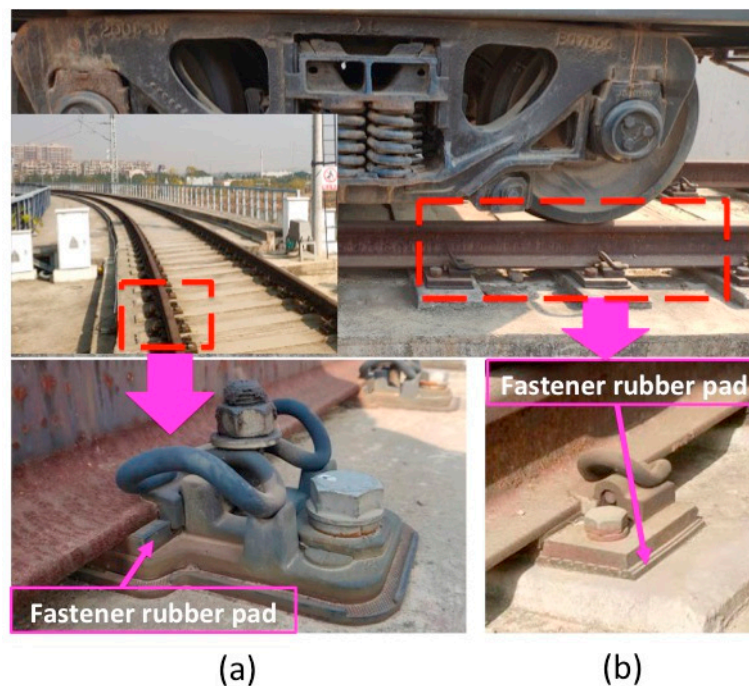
Details of the fastener rubber pad: (a) Fastener rubber pad of one fastener type; (b) Fastener rubber pad of another fastener type.
